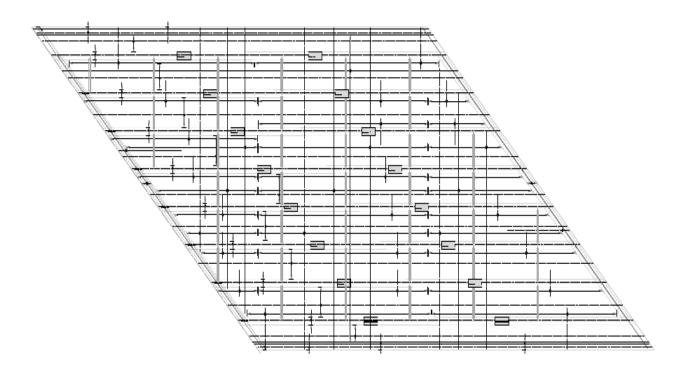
Plan view of the reinforcement detail of Deck Slab of higher skew angle
